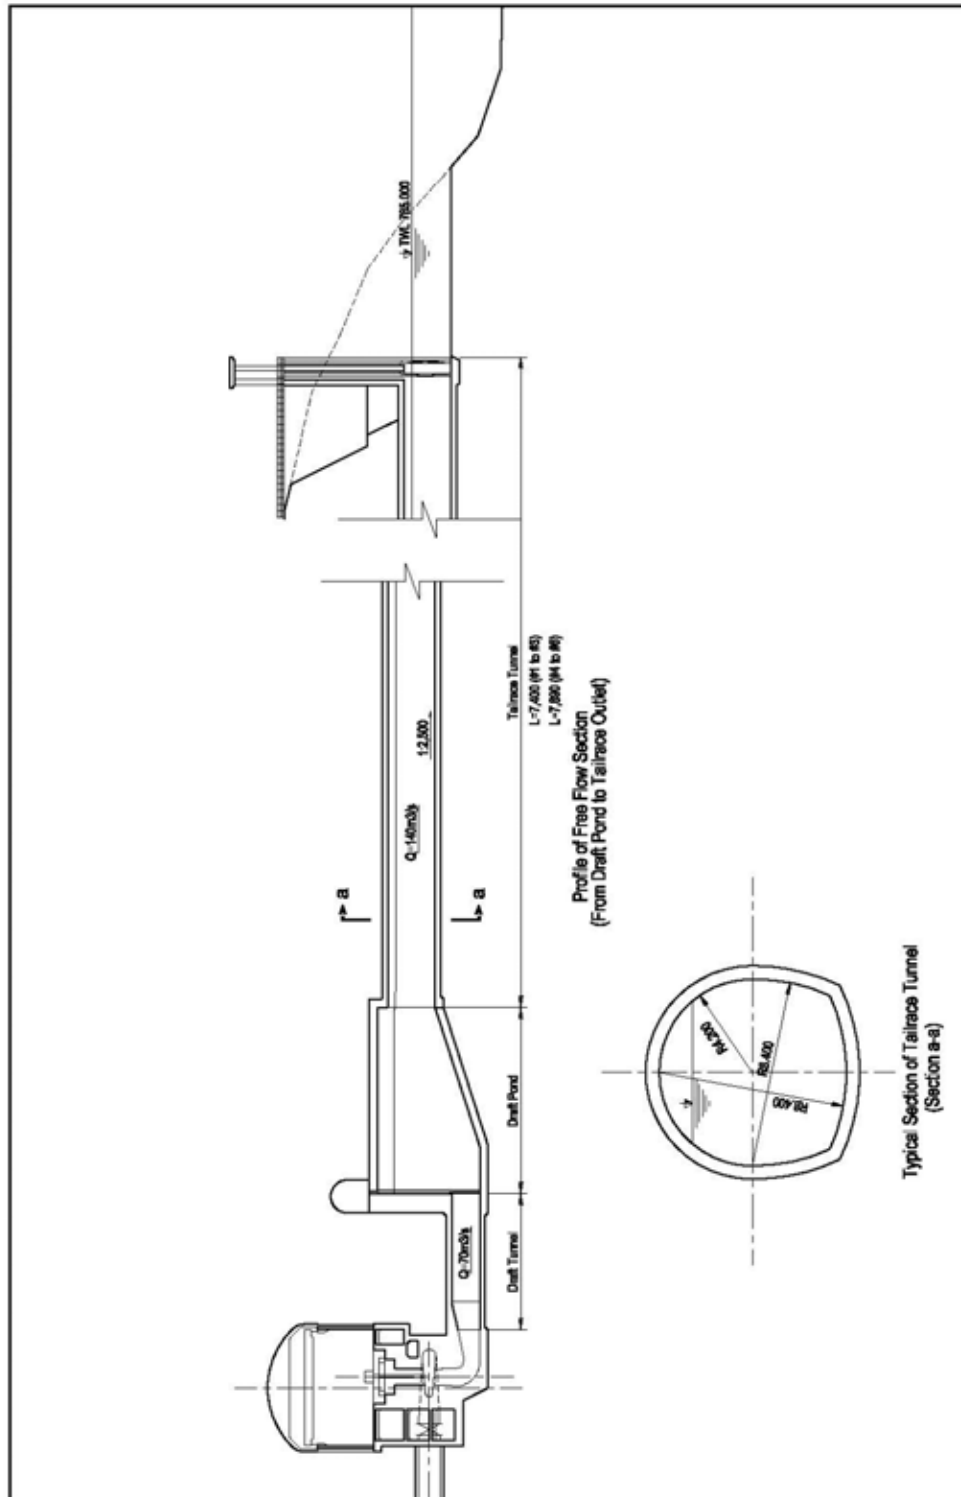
Profile and Cross Section of Free Flow Section (From Draft Pond to Tailrace Outlet)
